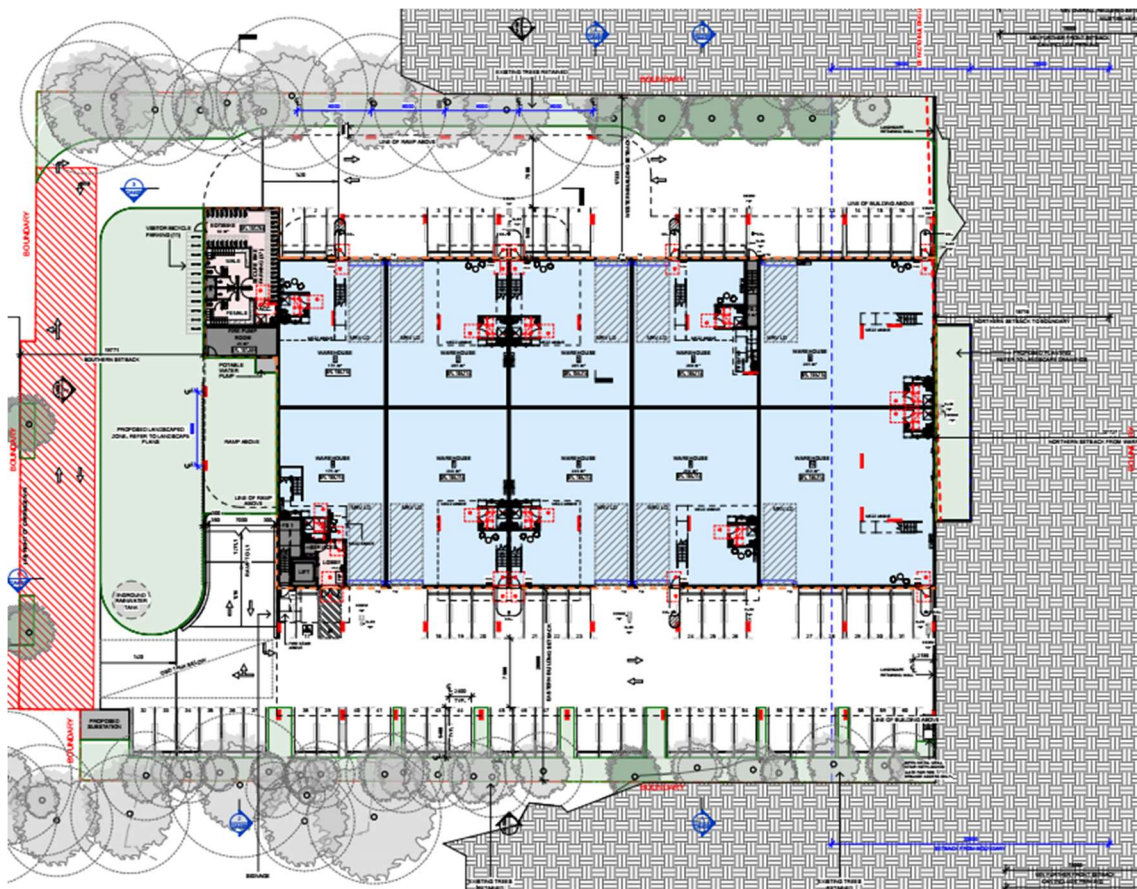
Ground Floor Plan extract showing the proposed layout of the development
